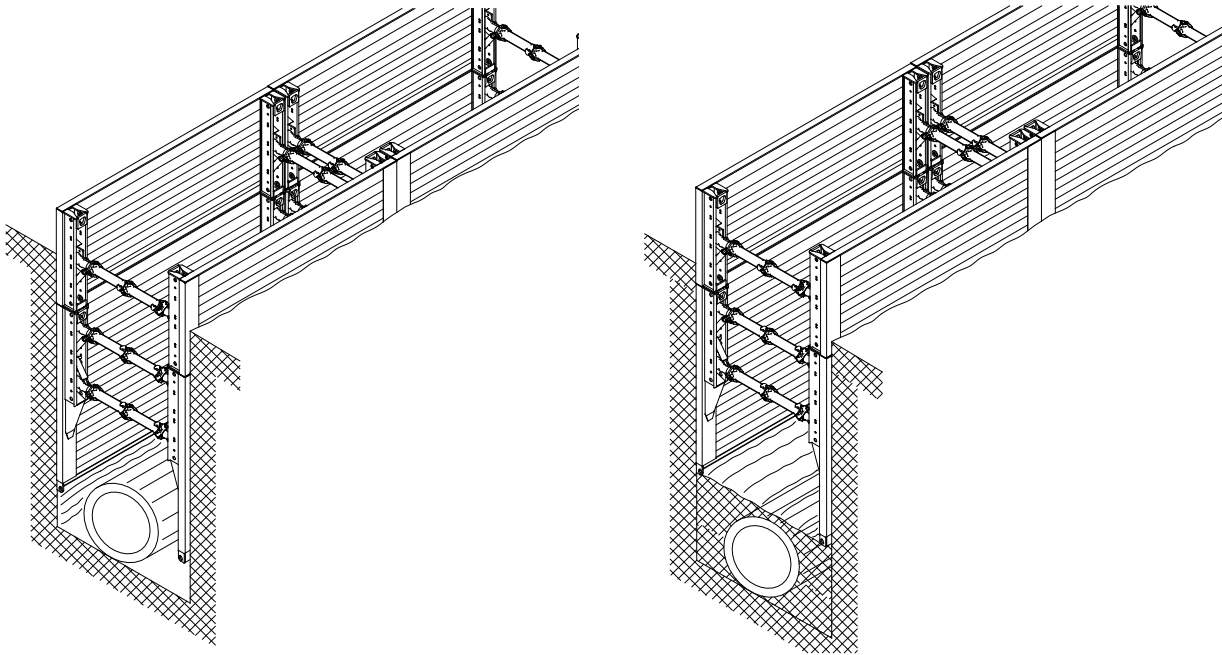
Extracting the shoring with backfilling and compacting of the trench
